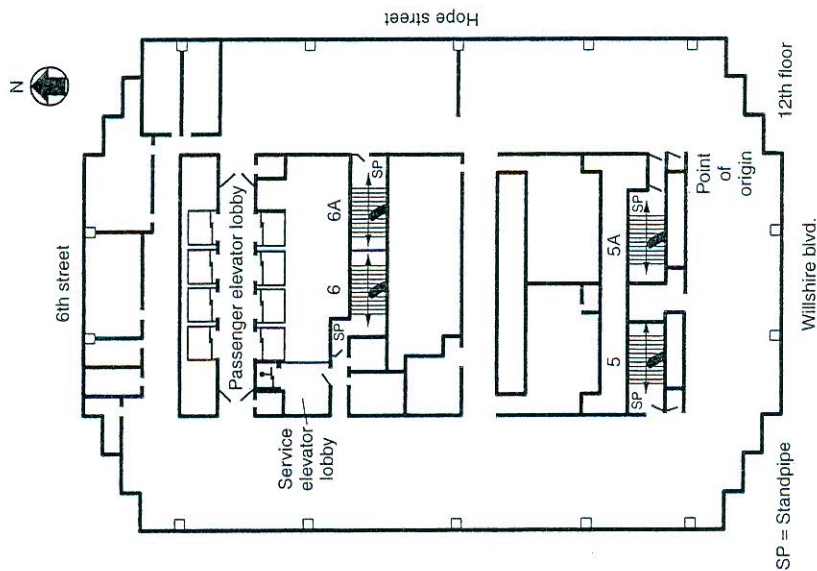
Typical floor area in Interstate Bank building (Nelson, 1987)
